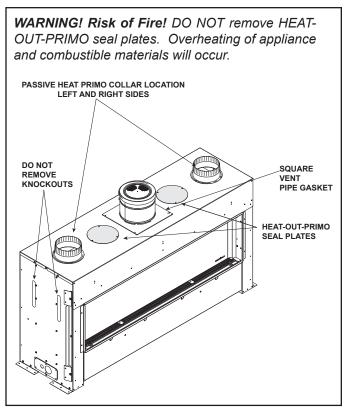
Remove PRIMO Passive Heat Seal Plates
